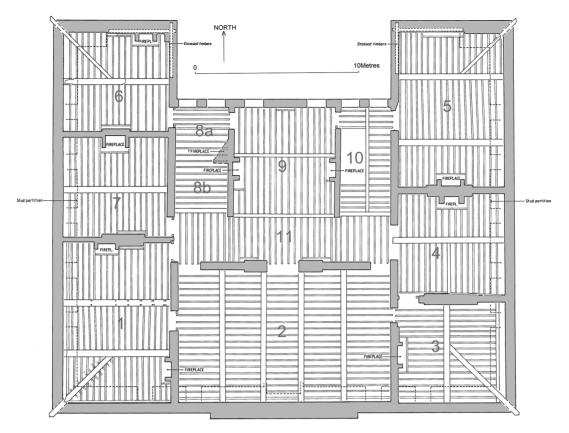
The original arrangement of the attic rooms and their floor beams and joists, based on surviving *in situ* evidence and salvaged timbers, with the room numbers used during the restoration and in the text.
